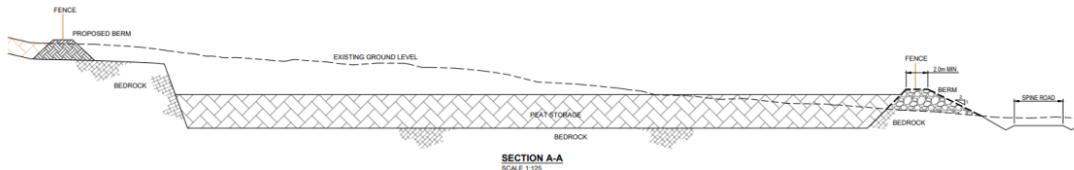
Cross Section of Borrow Pit South of Turbine 15).
